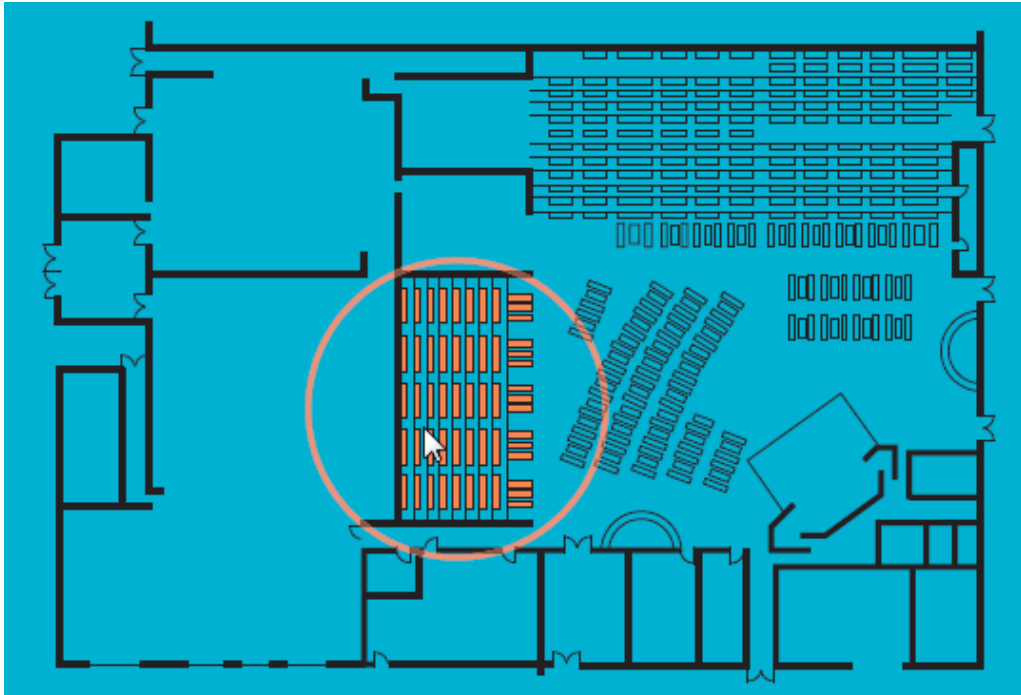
Floor layout of the disco (Image: Bo Andersson)
